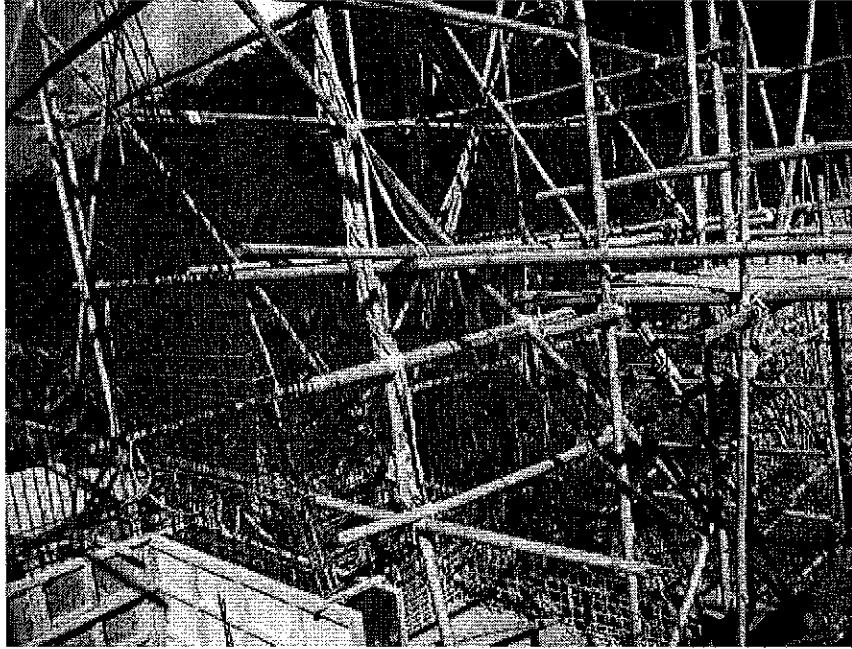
Construction of counterfort retaining wall at Marten dated 08..01.2015
